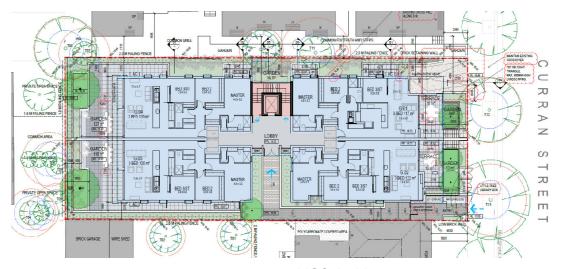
Proposed ground floor layout (Source: MGS Architects)
